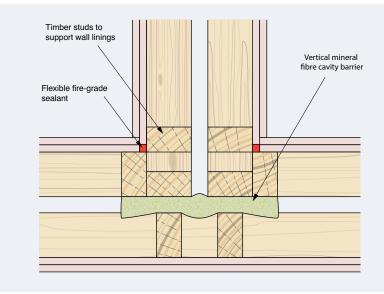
Double stud fire-protected timber internal wall intersection.
